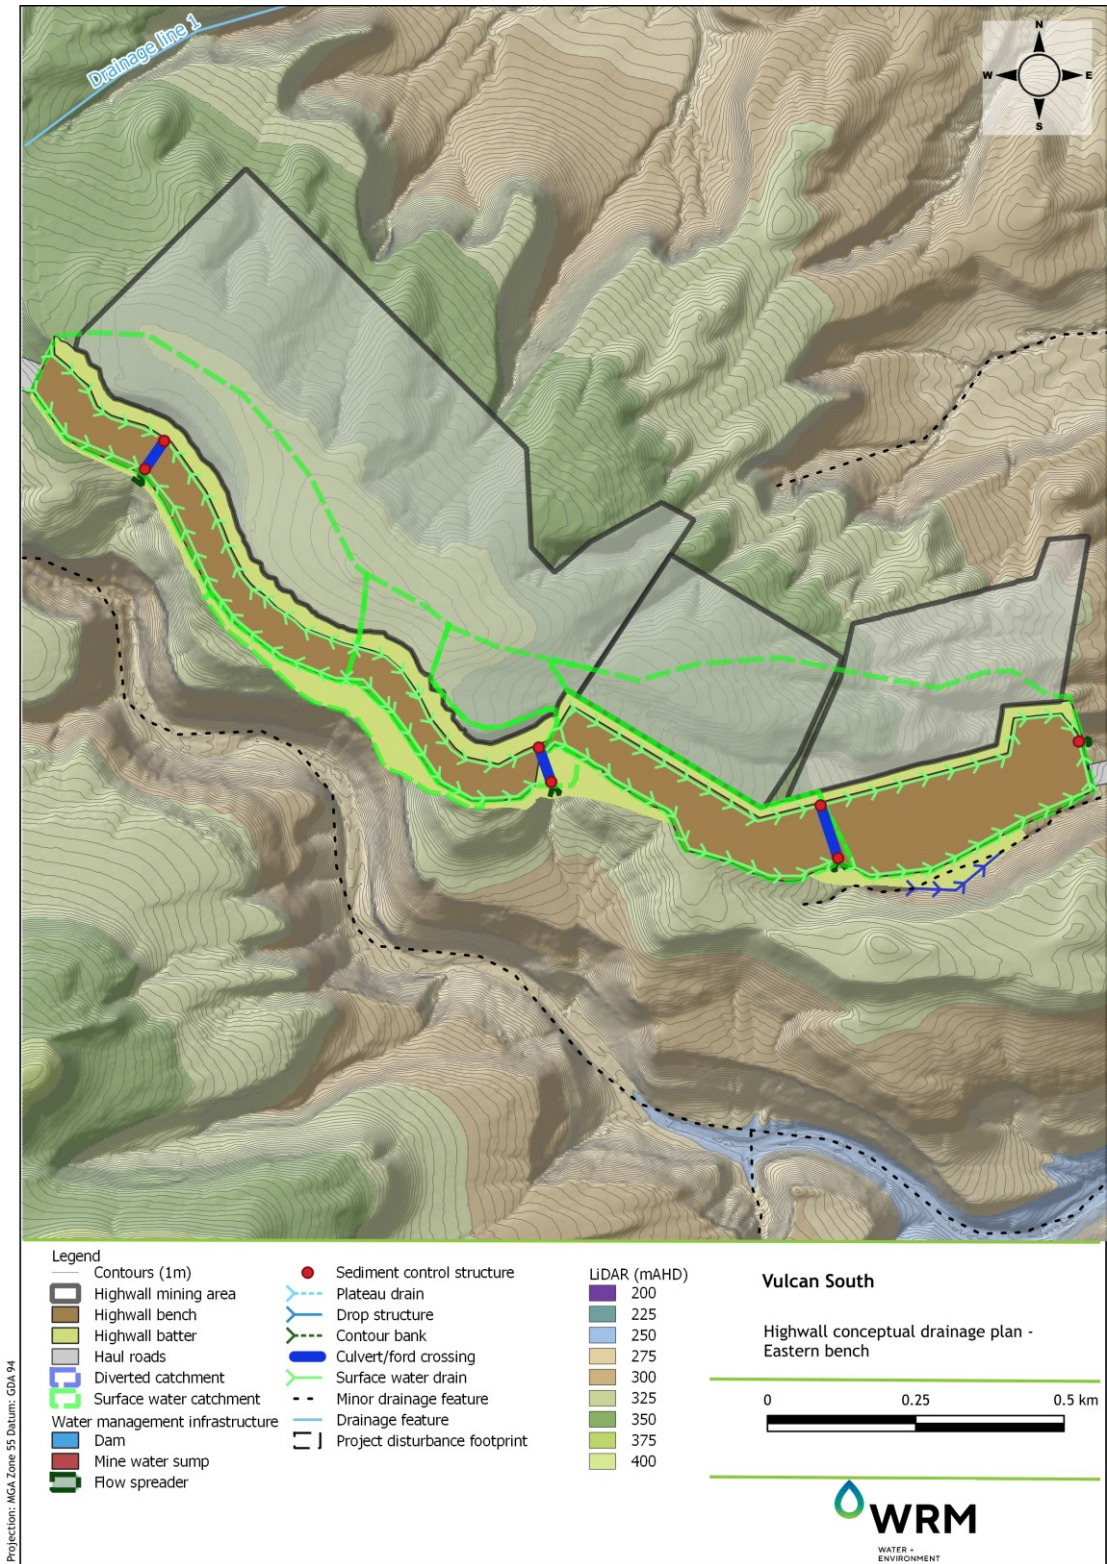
Highwall mining area east conceptual rehabilitation drainage plan (Year 2025)
